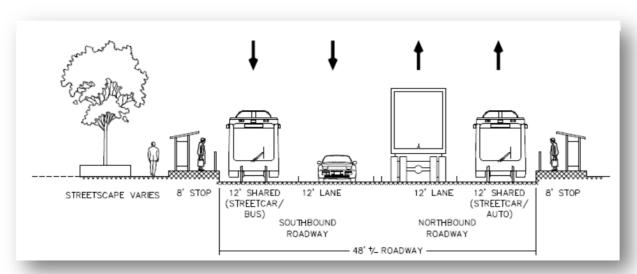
Proposed Typical Cross Section - Main Street South of 12th Street
